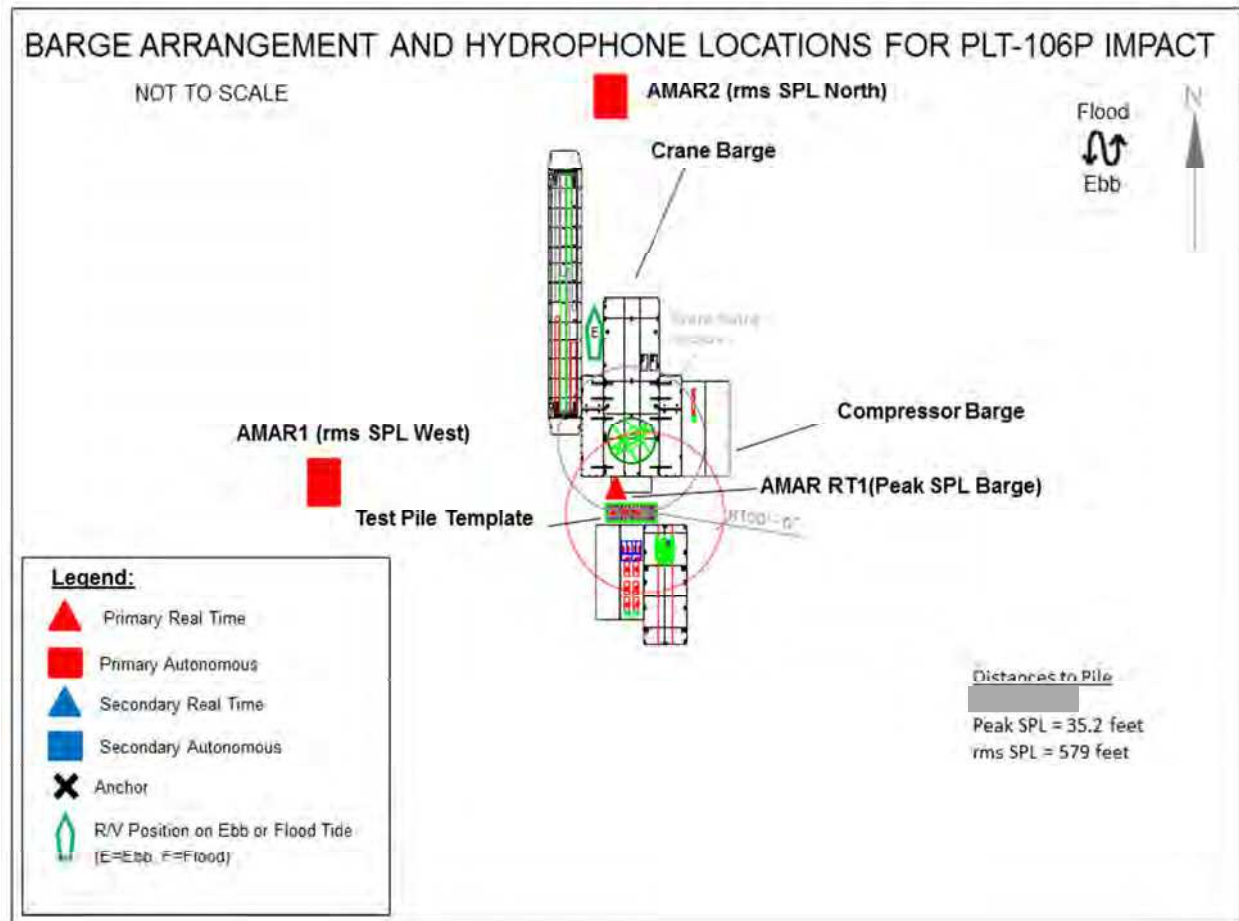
Plan view of pile and barge layout, 27 August 2013, PLT-106P.
